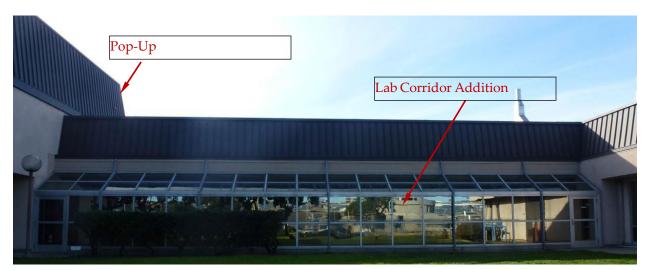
The Original Lab Building, Corridor Addition and the Pop-Up – View from East
